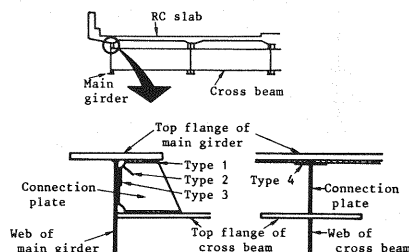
Fatigue cracks at cross-beam connections.
